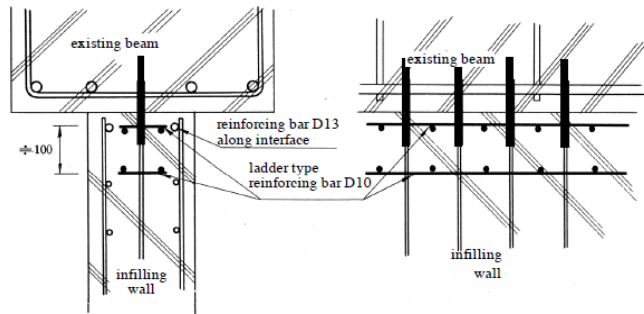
Strengthening against splitting with ladder type reinforcing bars
